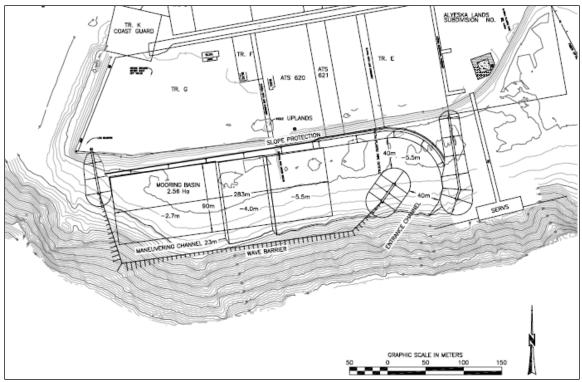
4. West Site Wave Barrier 243 - Vessel Configuration.
